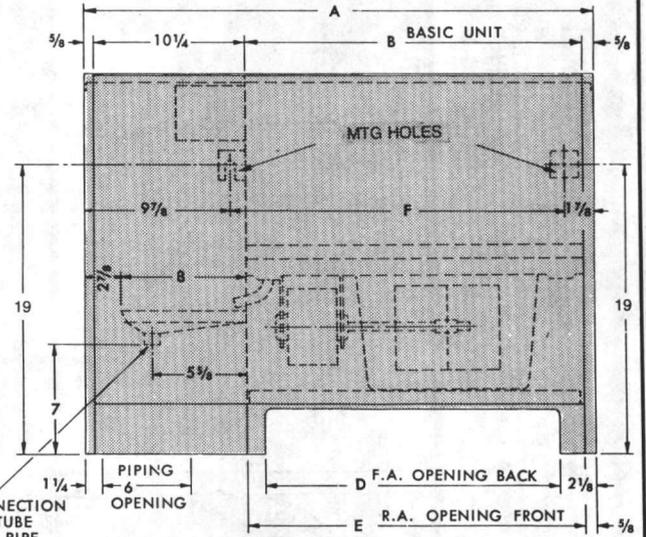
Unit Dimensions for Model B (Vertical Cabinet) Units, 02 to 06 Sizes
